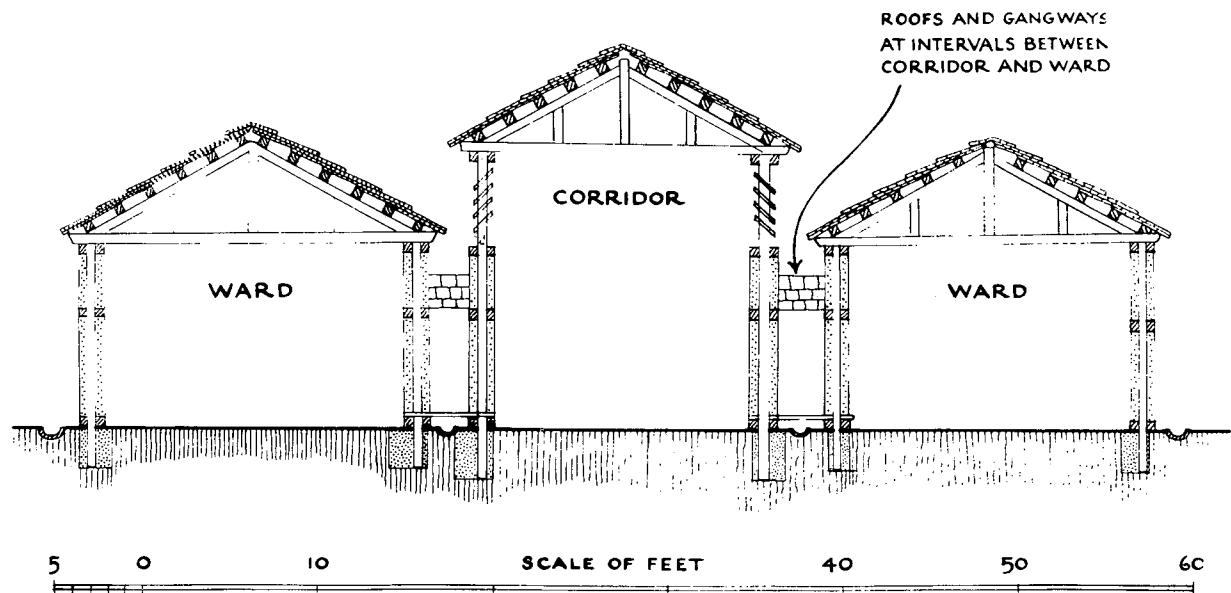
The Hospital, restored cross-section of north wing, showing suggested method of construction. Scale, 1:130.
